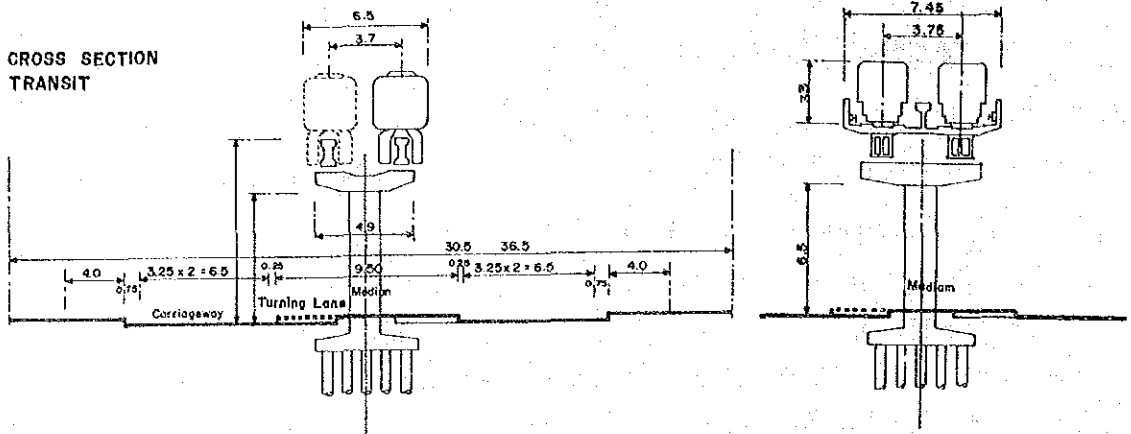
Typical Structure of Intermediate Rail Transit
